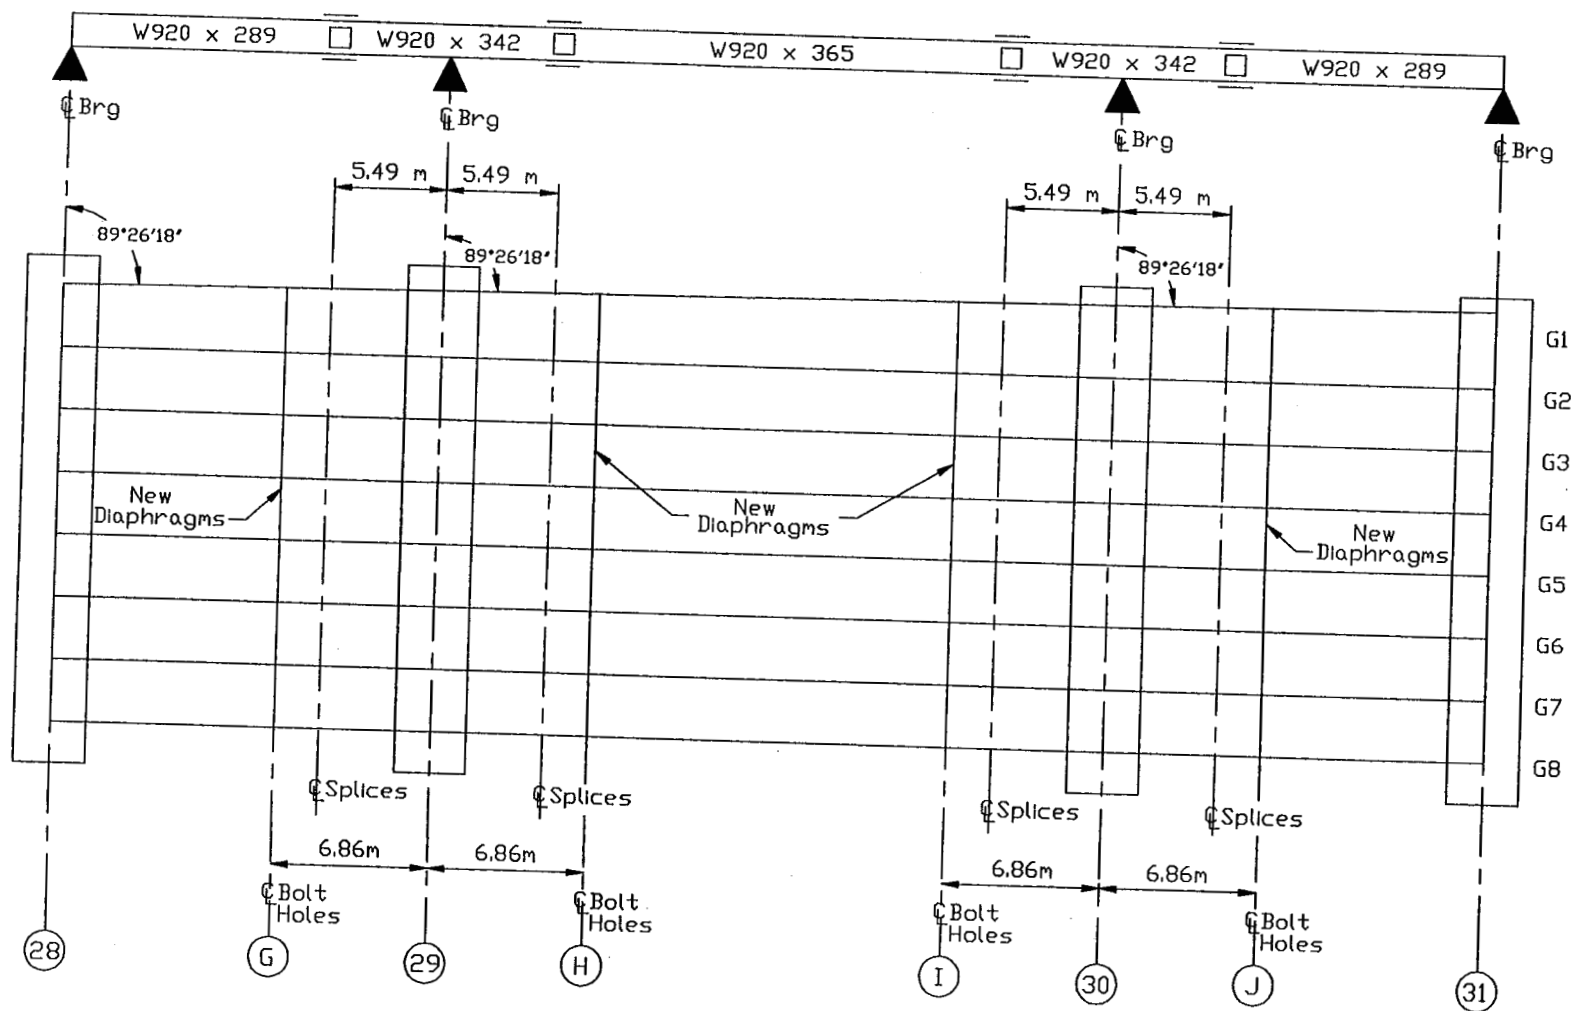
Plan View of the 76 m 3 Span-Continuous Bridge with New Diaphragms In-Place
